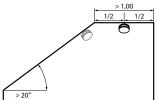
Straight mounting surface at least 1 m long and 1 m wide
